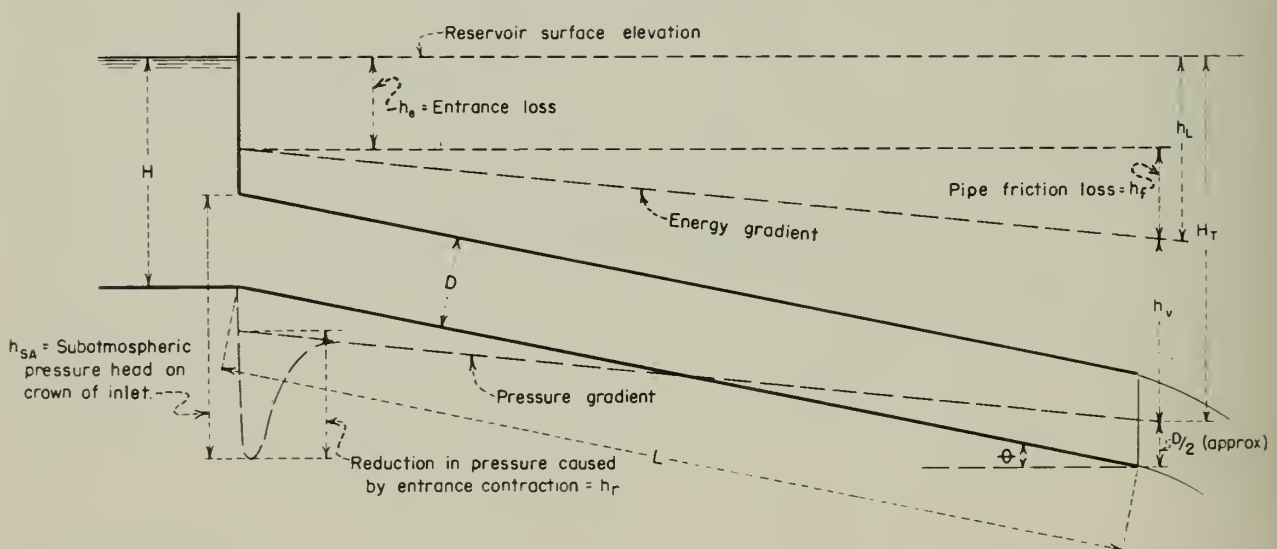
Hydraulic characteristics of full pipe flow for culvert spillways.
